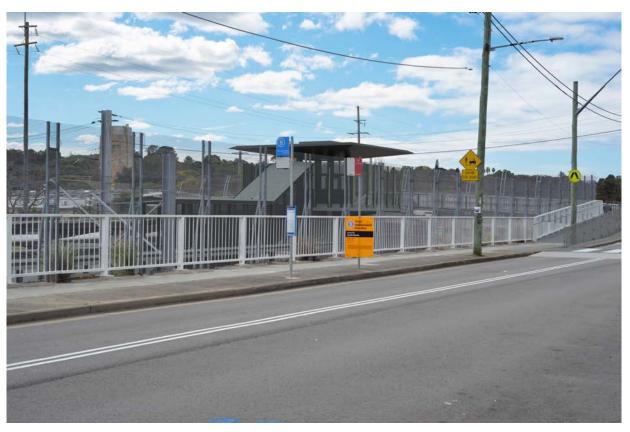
Photomontage showing the proposed changes to the existing view of Turrella Station from VP3, subject to detailed design
